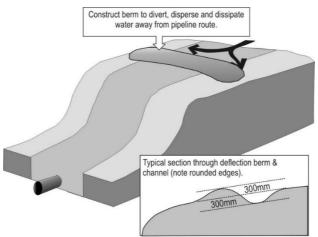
Typical application of a deflection berm to avoid erosion of a pipeline route
